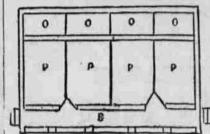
FLOOR PLAN OF PIGGERY. feet from ground. Partitions and floors are 2-inch hemlock. The troughs are 2-inch oak plank. Partitions between entry and pens are built slanting down to top of troughs, so that the hogs can not get into them. Doors at the ends,
